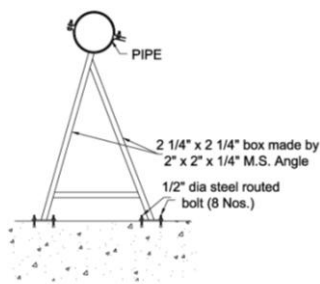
Pipe support at the discharge line of PP1 from the East wall
